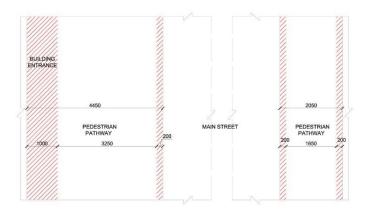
Street width and buffer spaces (in mm) for Gateway 9 in the area surrounding Frankfurt am Main Hauptbahnhof
